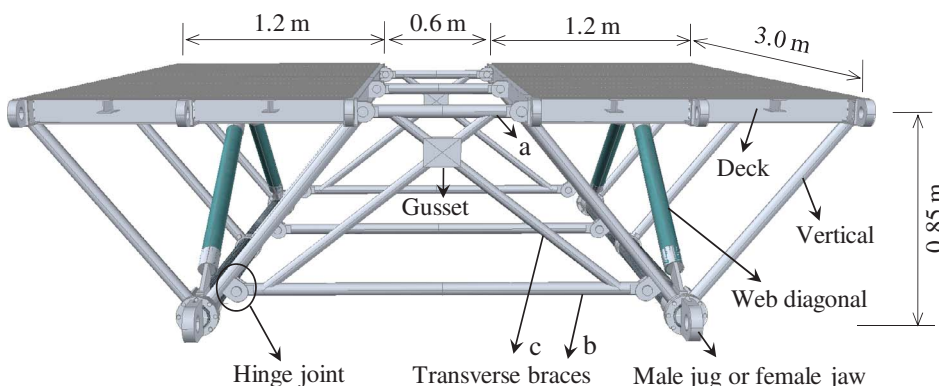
A modular unit of the hybrid twin-trackway space truss bridge.
